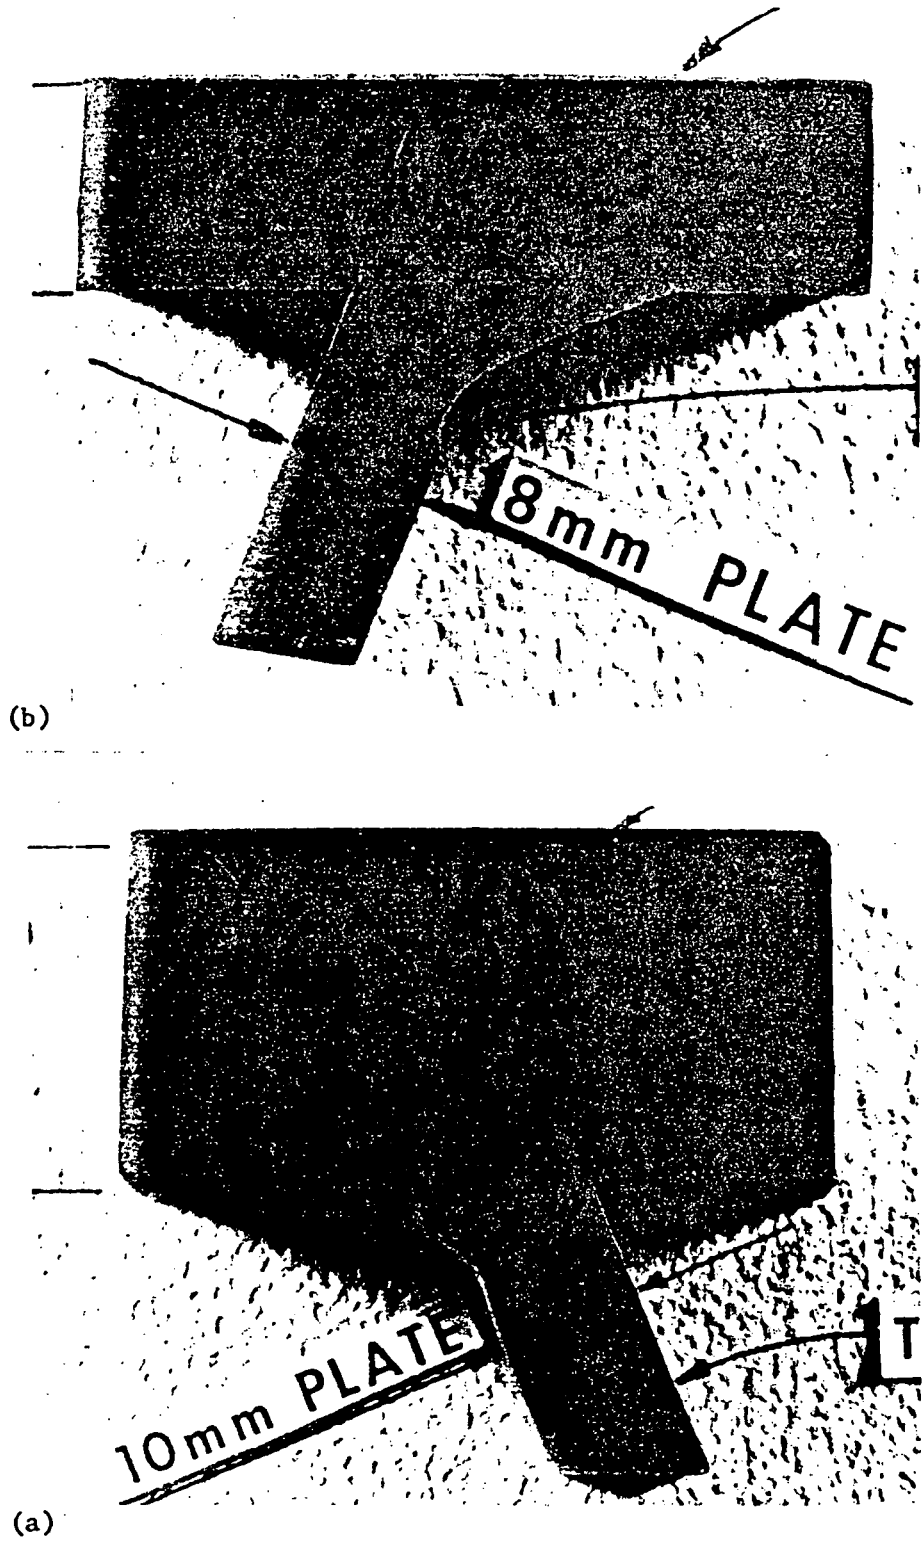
Enlarged Cross Sections of Stiffener Web Plate to Deck Connection
